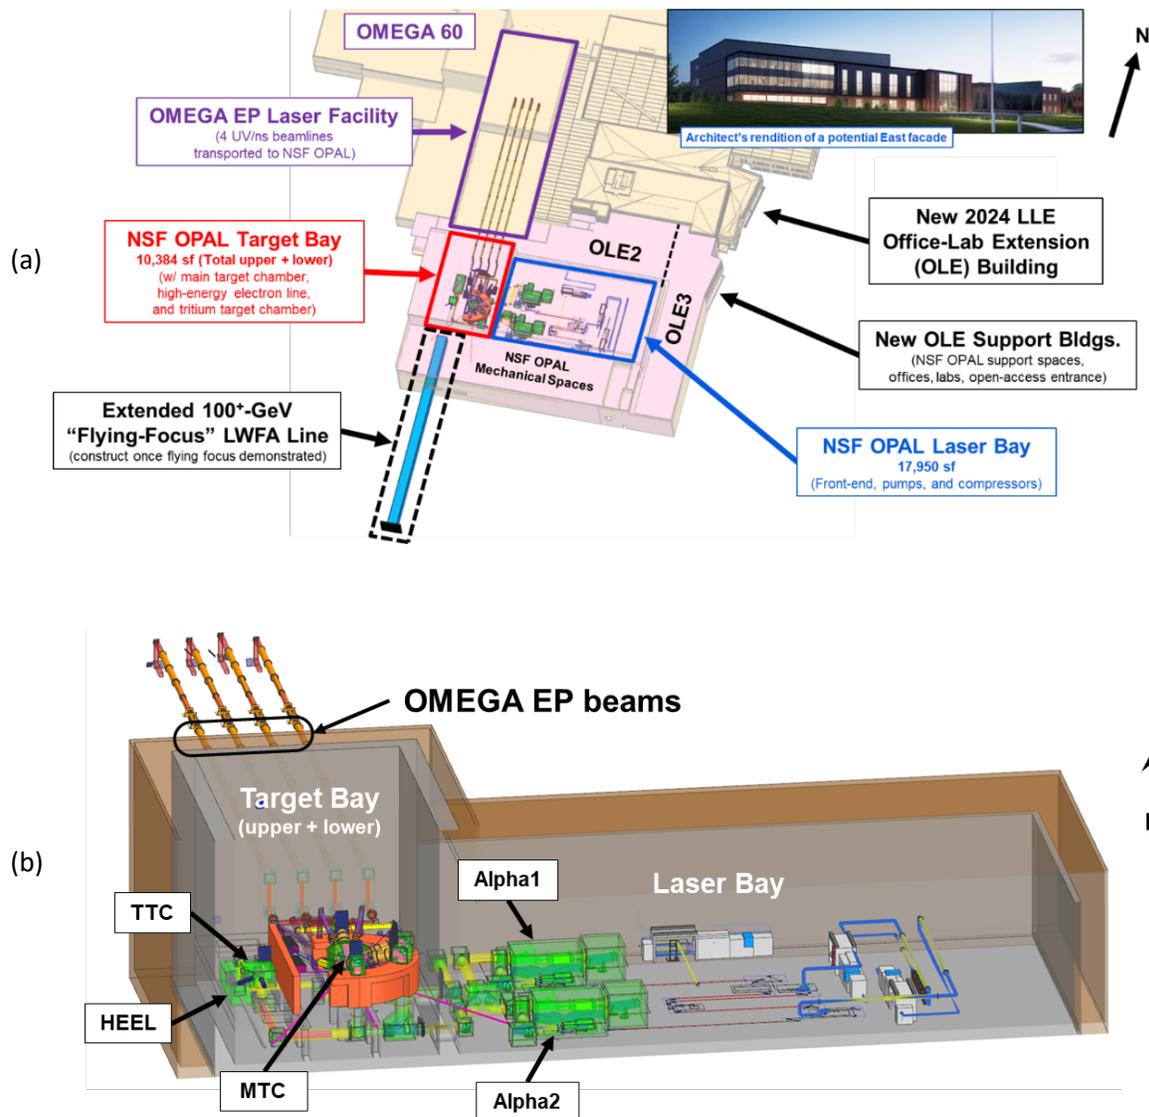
Conceptual design of the NSF OPAL user facility. (a) Two new buildings adjoin the existing UR/LLE facility: the NSF OPAL facility with associated mechanical spaces, and additional office/lab extensions (OLE2/OLE3). Inset shows an architectural rendering of the OLE3 East façade. (b) A cutaway view of the NSF OPAL facility shows the ground-level laser bay with beam transport and the high-energy electron line (HEEL) chamber in lower target bay and the main target chamber (MTC) and tritium target chamber (TTC) in the upper target bay.
